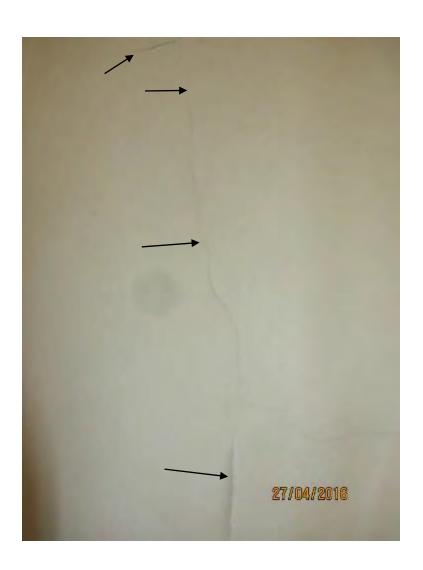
shows hairline cracking and lifting paint to the northwest corner of the Dining room – Note: staining to the ceiling
